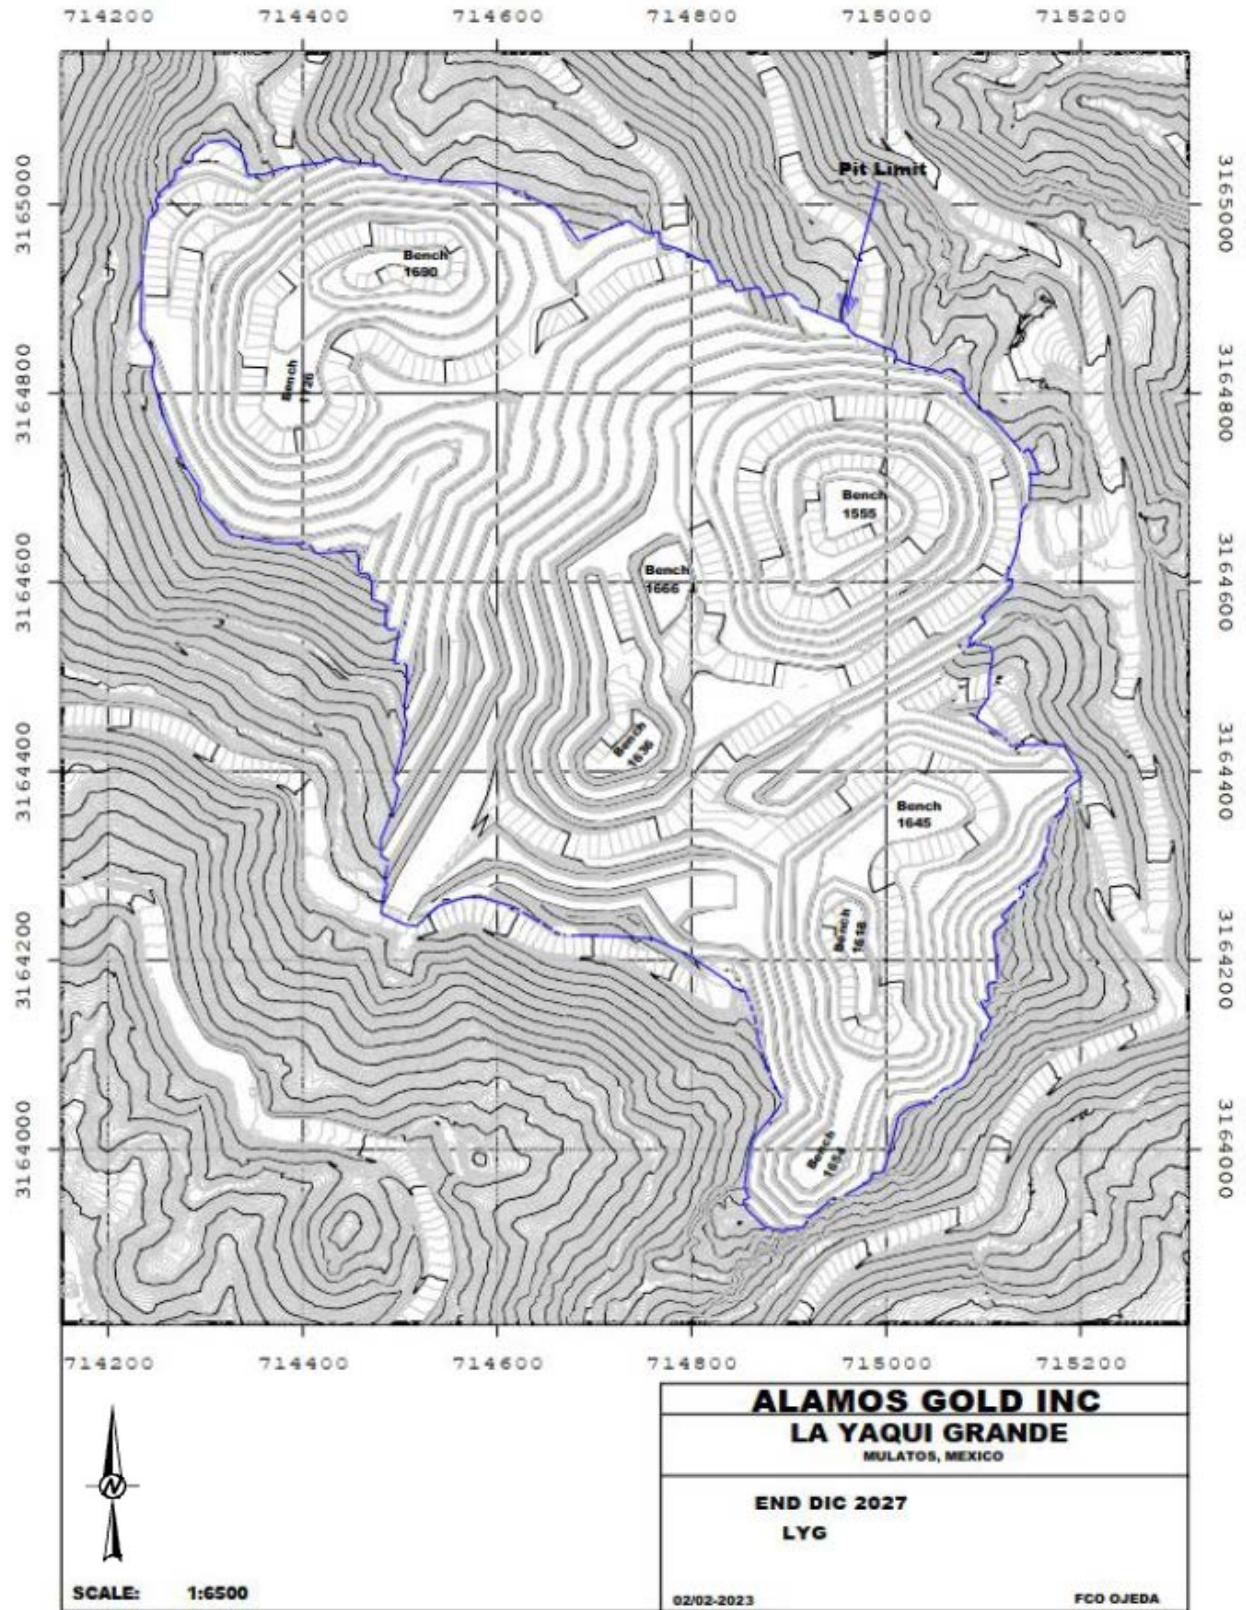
La Yaqui Grande Pit Plan, End of 2027
